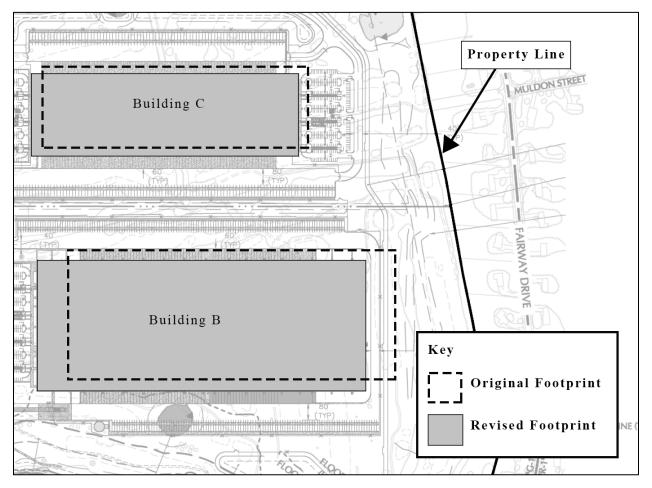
Building Movement. Prepared by Town Staff using applicant's plans.
